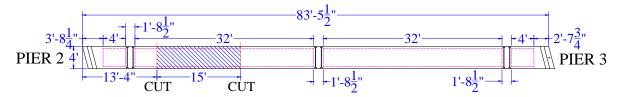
Plan View of Span 3 Beam 2 of Main Street Bridge
